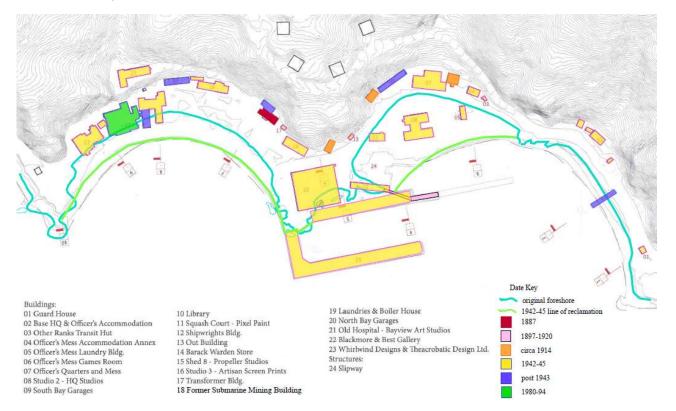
Phasing of construction of buildings on the Shelly Bay redevelopment site. Source: Archifact 2019, Appendix C
